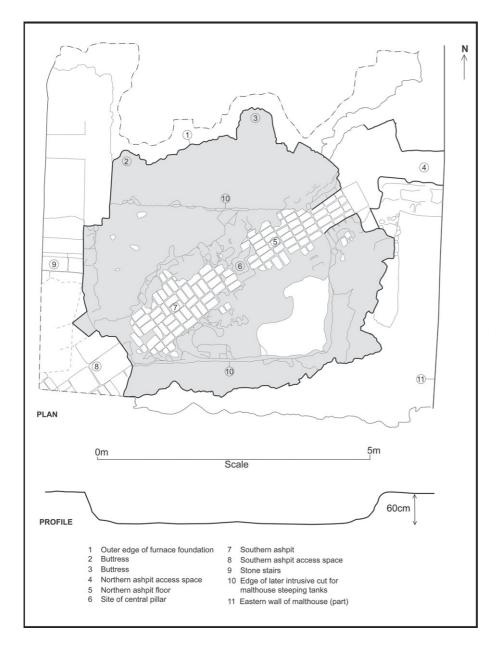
Plan of the southern furnace (c1630) as excavated, showing the extent of the furnace foundation and associated flooring. Note the later truncation in the central part of the furnace by the 18th-century malthouse steeping tanks. The profile is reconstructed from various investigations and does not represent a measured cross-section. Drawing by Sophie Watson.
